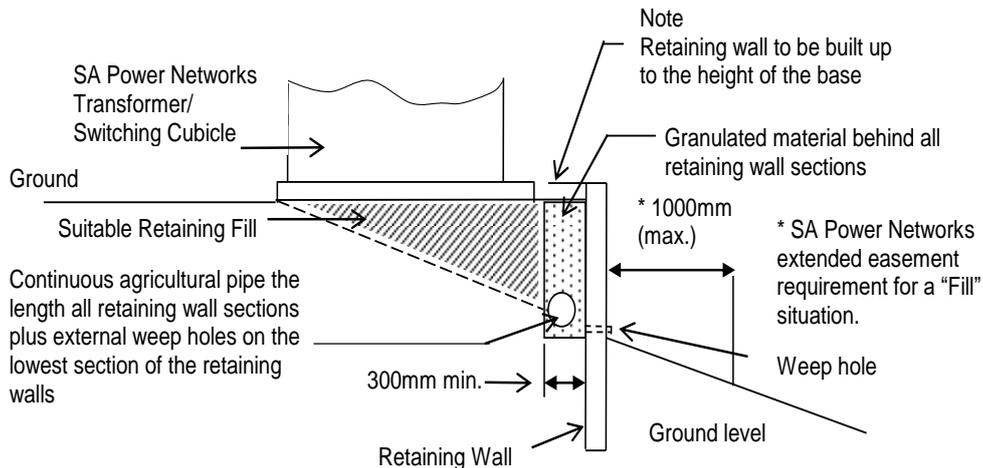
Retaining Wall – Fill (1000mm Maximum Buffer Zone)
